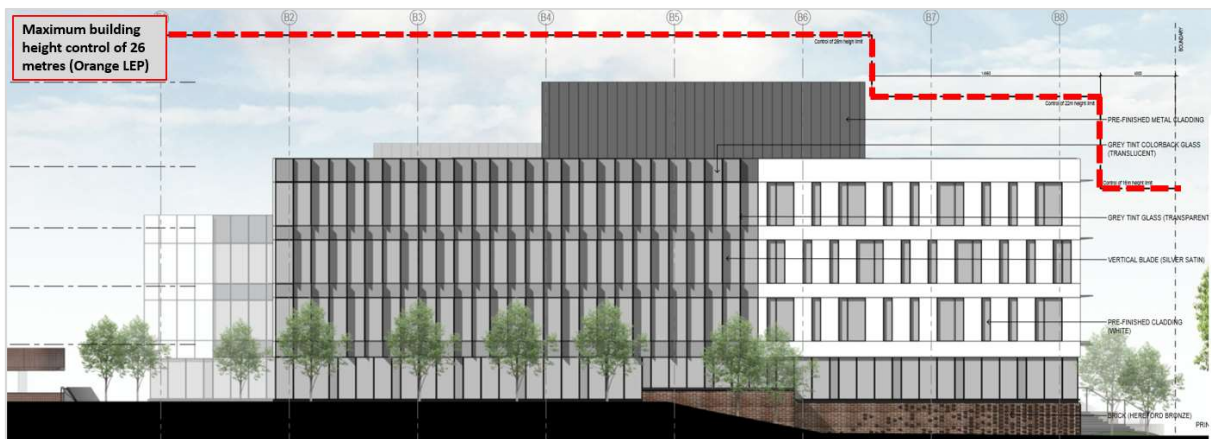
Western elevation – view from adjoining Lot 501 (Source: Group GSA)
